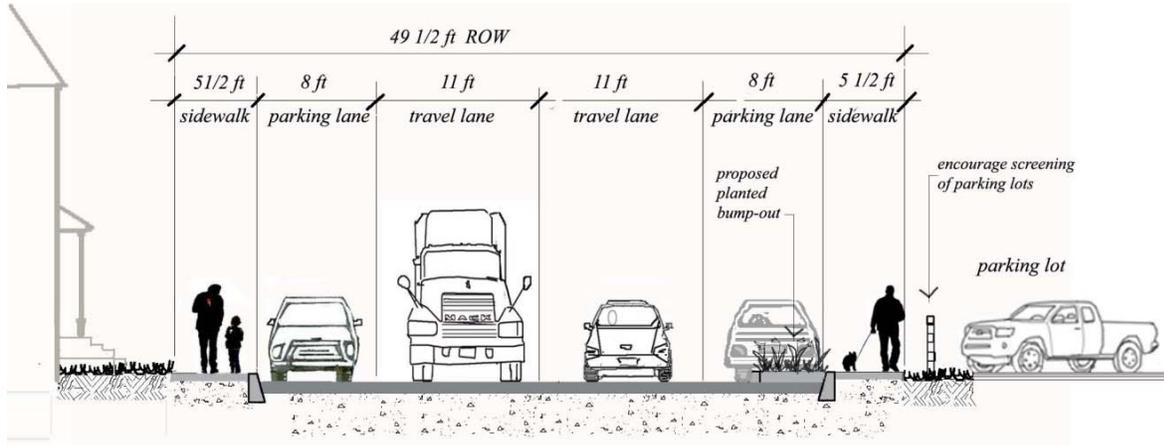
PLAN VIEW OF EAST MAIN STREET OPTION A WITH PARKING ON BOTH SIDES OF STREET
